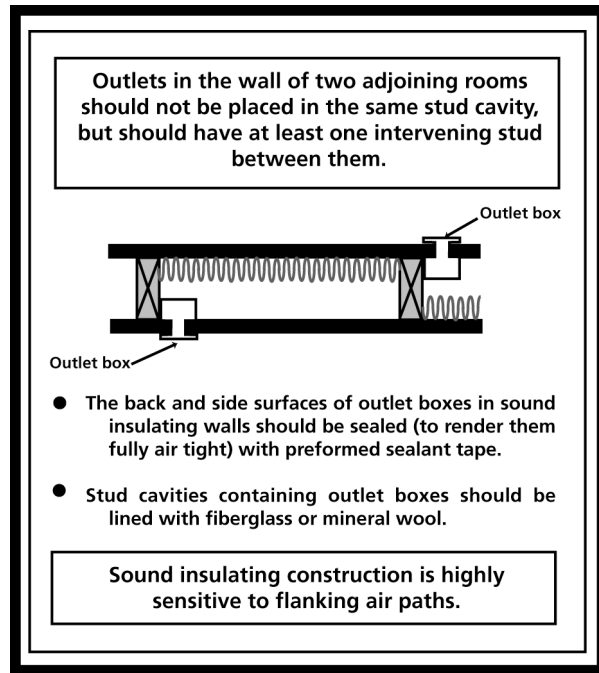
Proper sealing of electric power outlet boxes in walls
